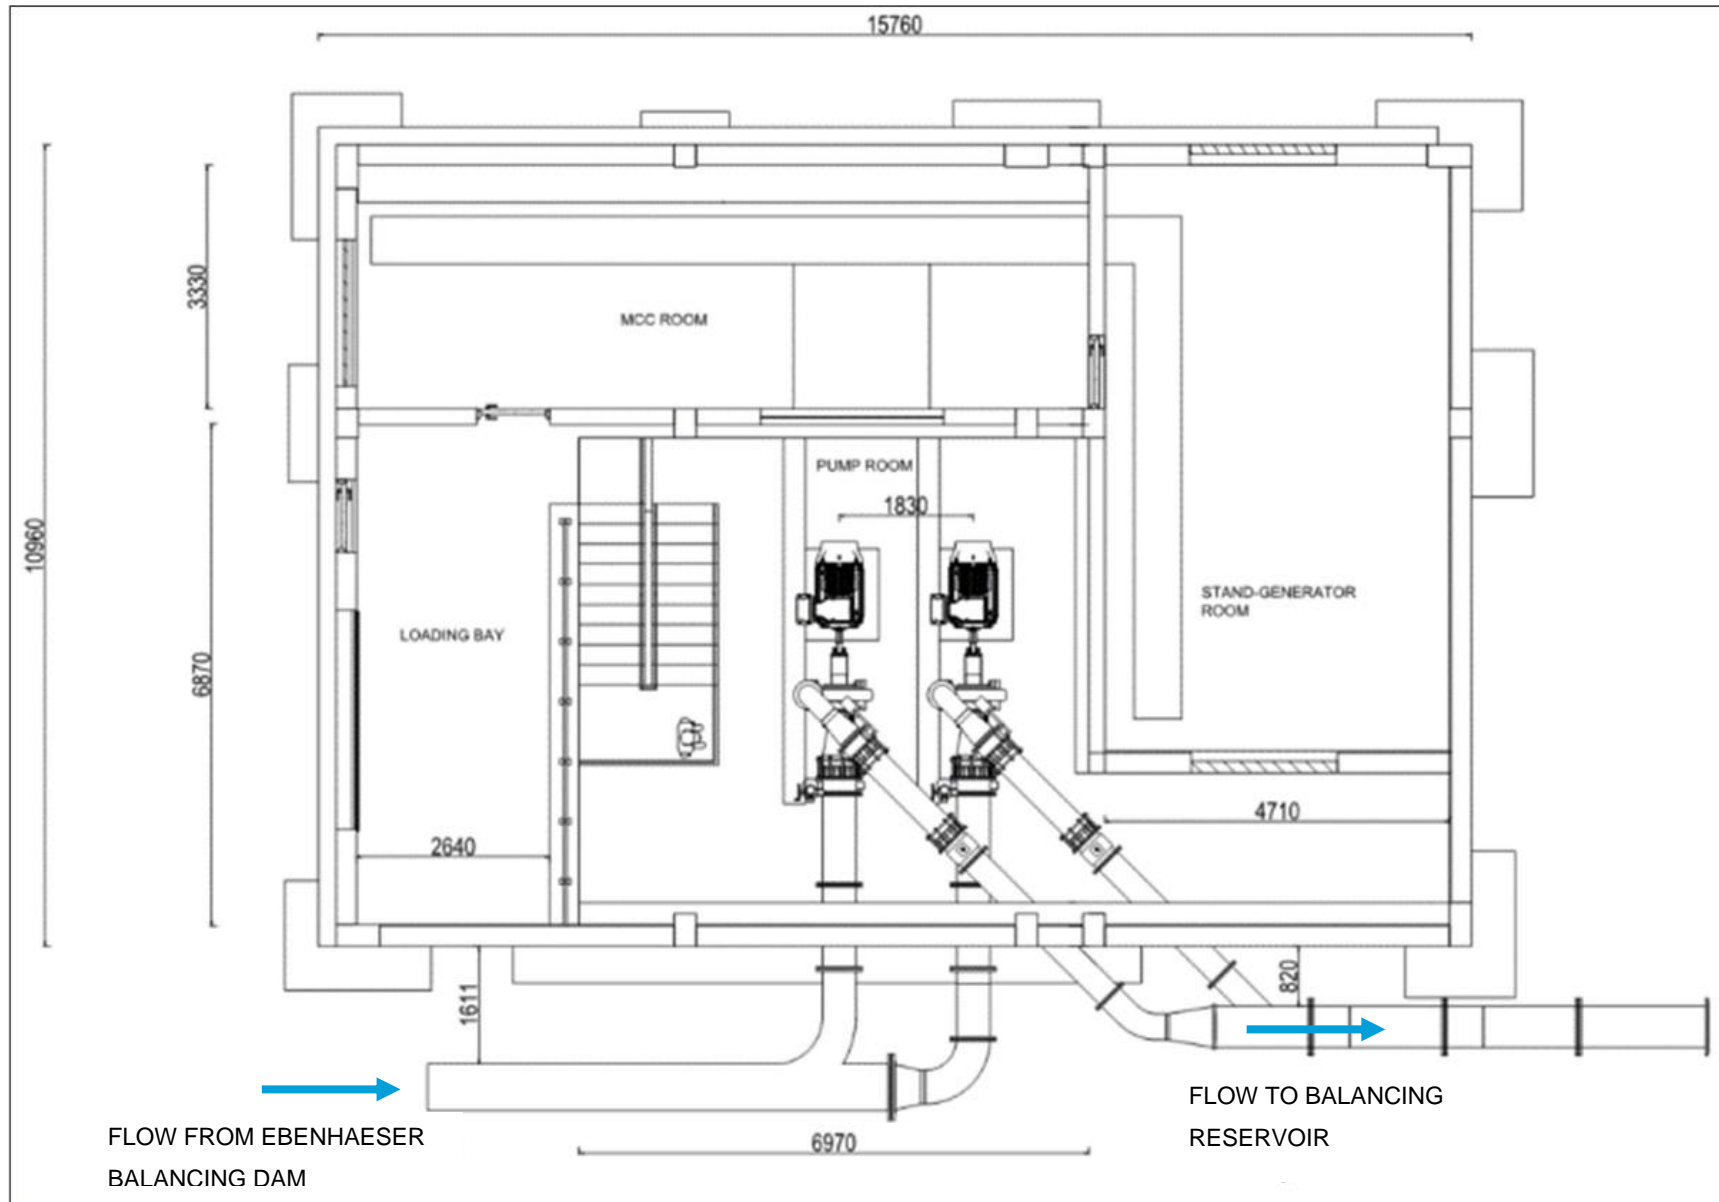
Plan view of Ebenhaeser Balancing Dam Pump Station
